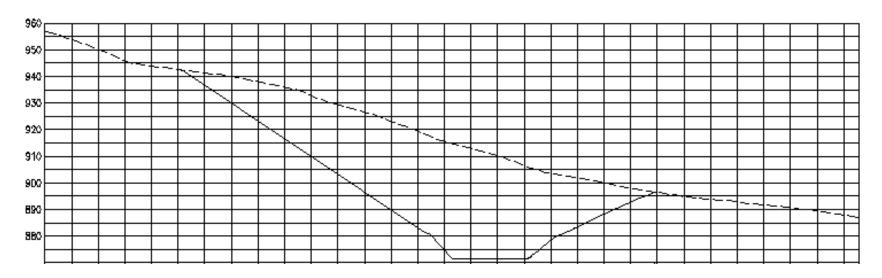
Embankment longitudinal section and initial excavation design for Section 01
